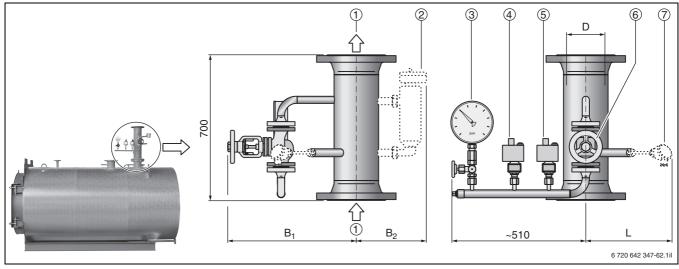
Boiler safety equipment assembly for Logano S825L/L LN and Logano plus SB825L/L LN (intermediate flow piece with valve distributor and valves; dim. in mm)
